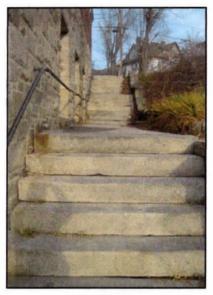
Uneven granite steps at south end of building as seen from Main Street
